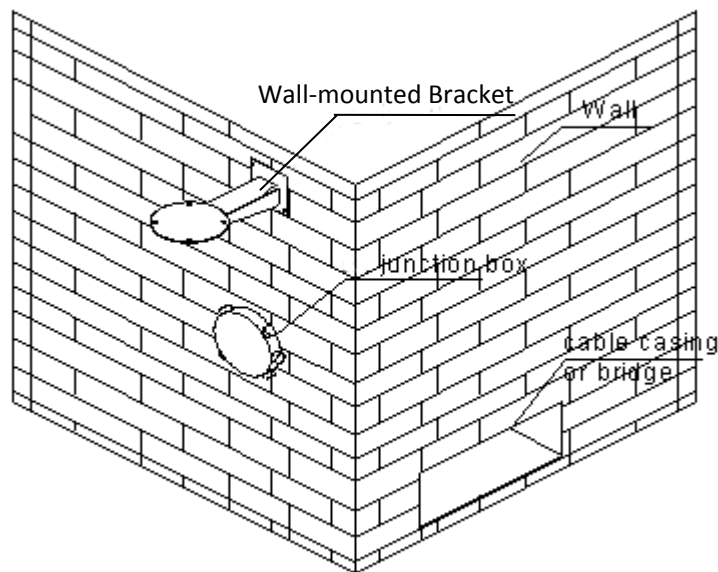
Installation of Wall-mounted Bracket
